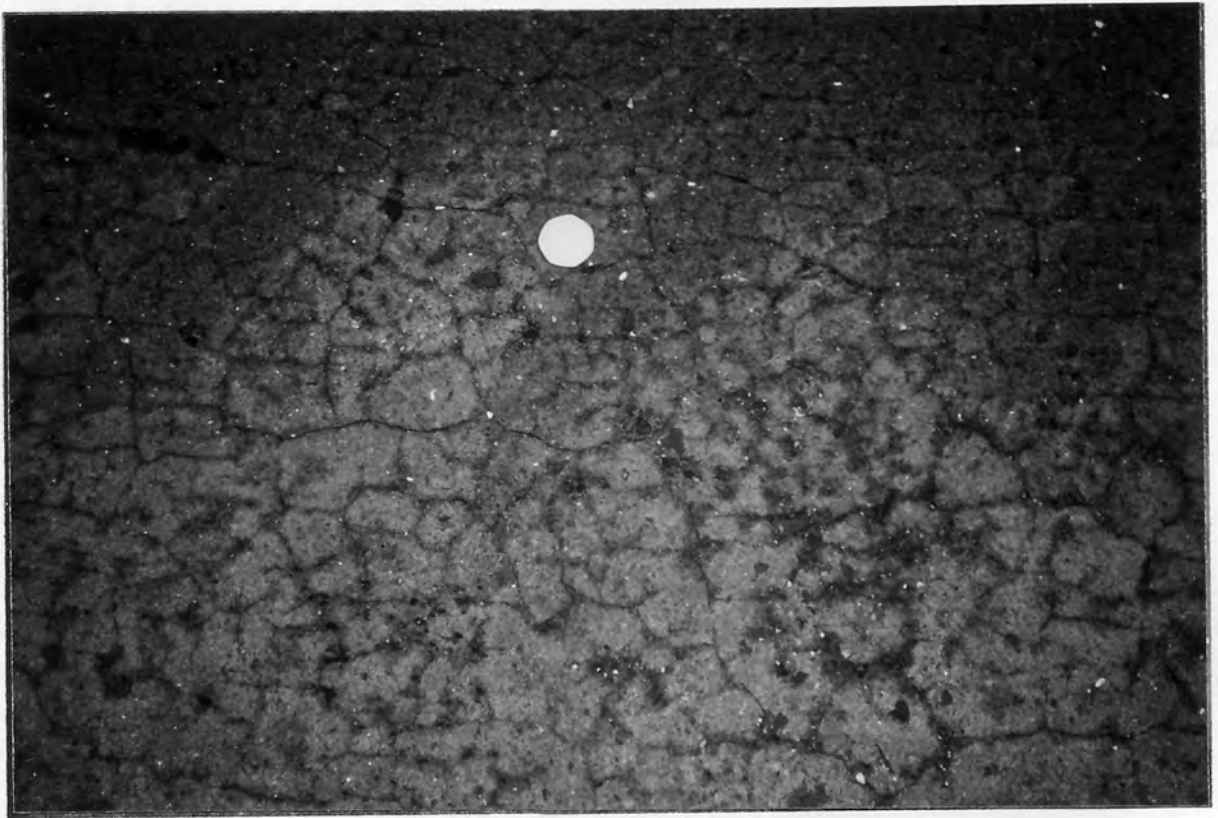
Sweaty moist area of concrete surface, feature often associated with ASR reactive aggregate. This core was taken from a road pavement in Lancashire and contains Horrocksford limestone.
